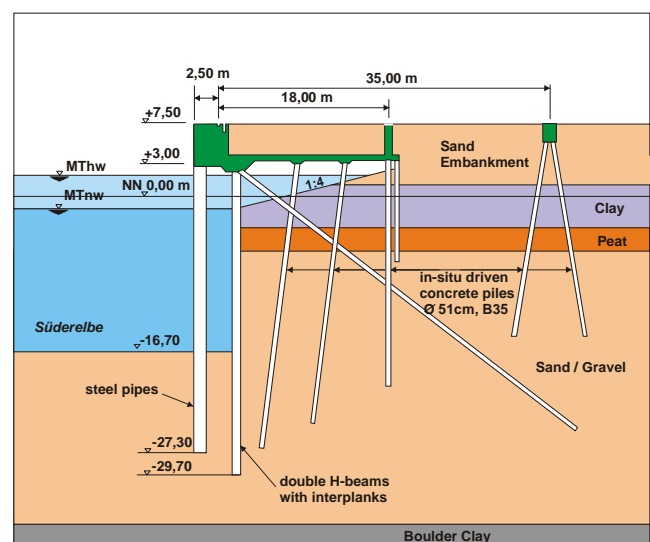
Cross section (Freie und Hansestadt Hamburg 1999).
